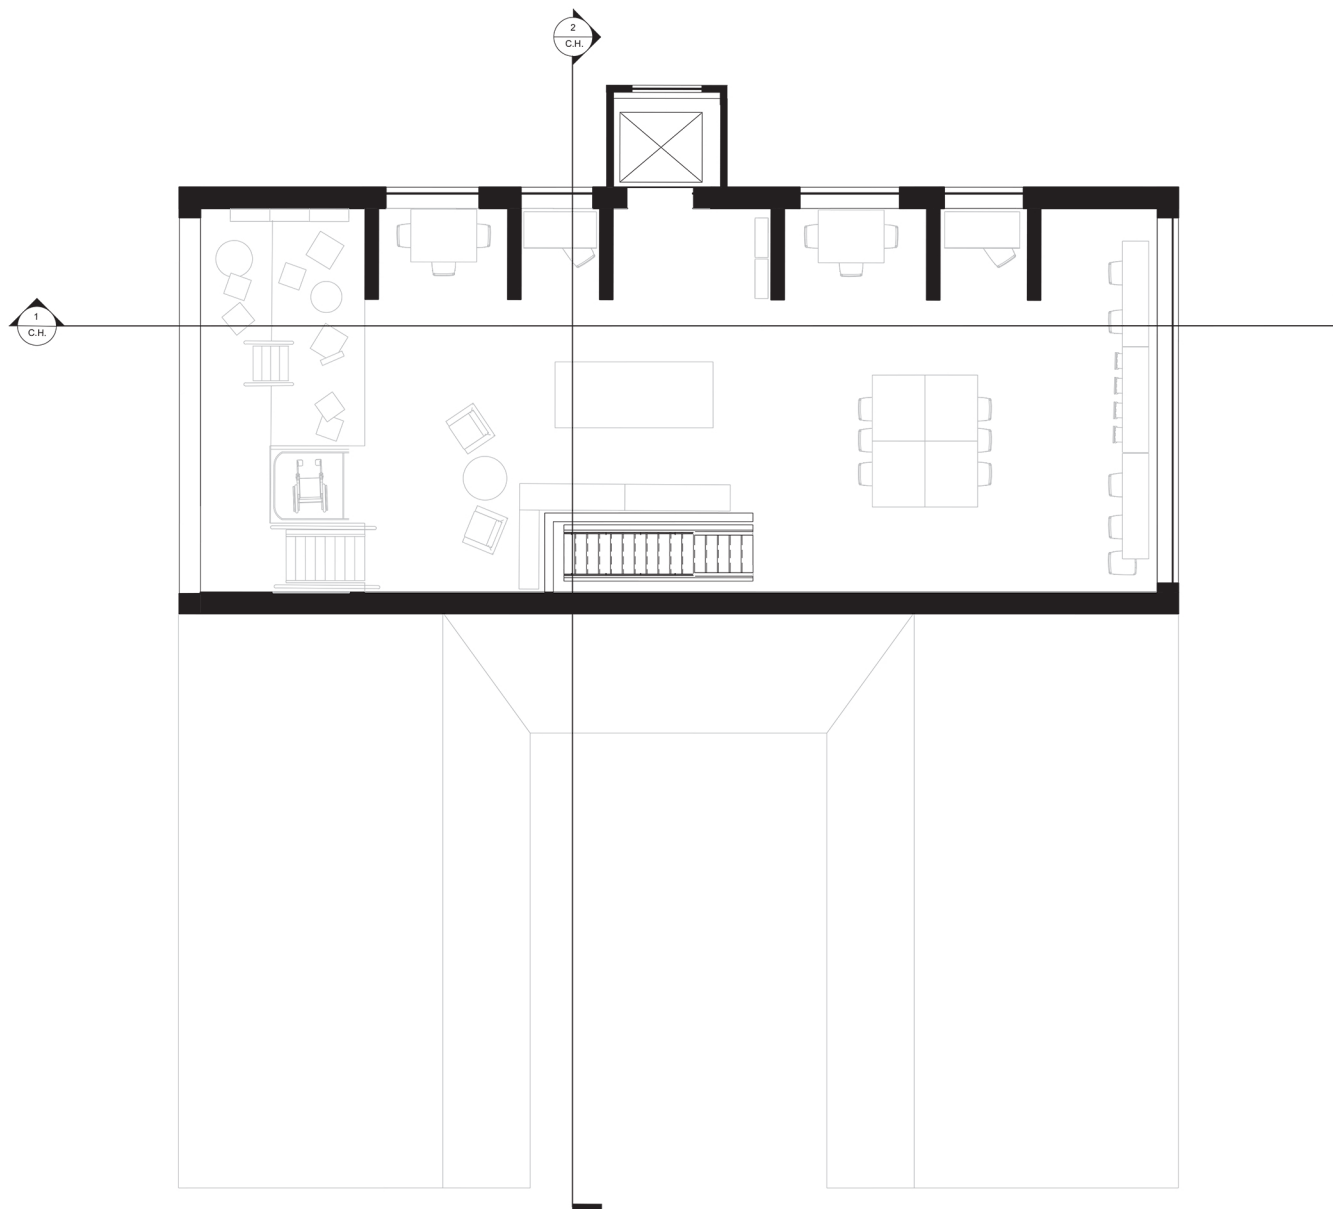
Author, *Proposed Women's Transitional Cohousing Third Floor Plan 1:175*, 2019.
